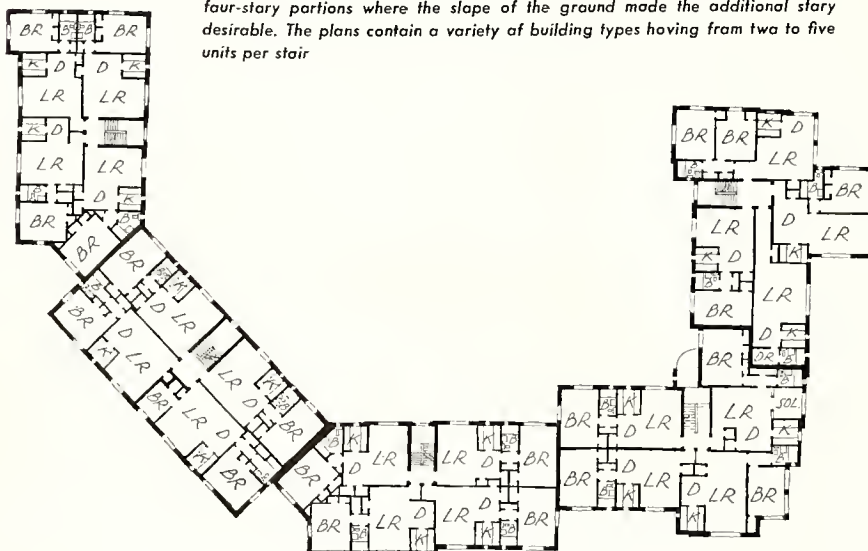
The Prince George Apartment, Hyattsville, Md. Eugene B. Roberts, owner and builder; Joseph H. Abel, architect. A suburban garden type building on a site of about 4 acres, traveling time by auto to the center of Washington, D. C., is about 20 minutes. Consists mostly of three-story buildings, with a few four-story portions where the slope of the ground made the additional story desirable. The plans contain a variety of building types having from two to five units per stair
